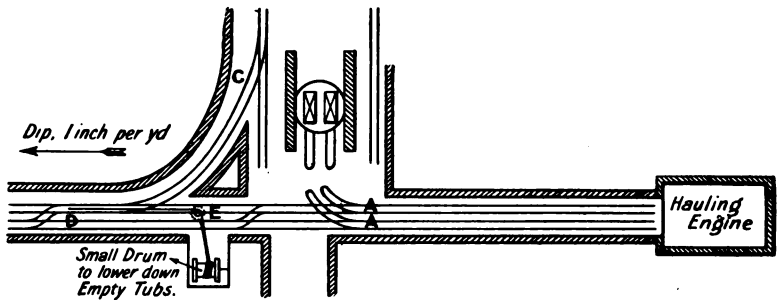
An Arrangement of Shaft Sidings for Main-and-Tail Rope Haulage.
